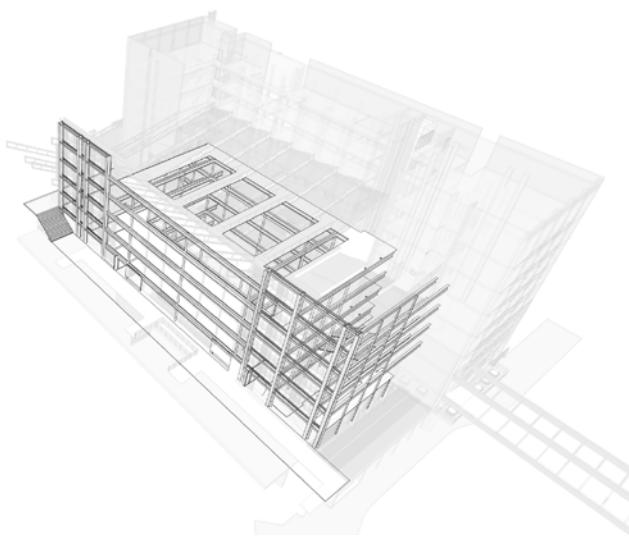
Secondary structure plus floors: horizontal trusses tie the primary structure to the columns of the existing Govpret building. Floors provide stability for the secondary structure.
